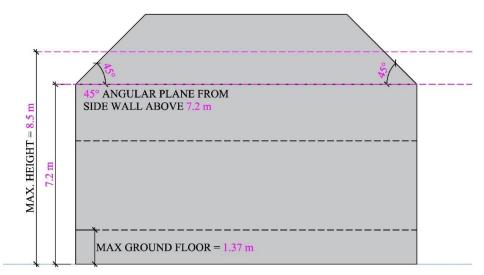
K.F9: Parallel Massing on Pitched Roof Building – Side Elevation
